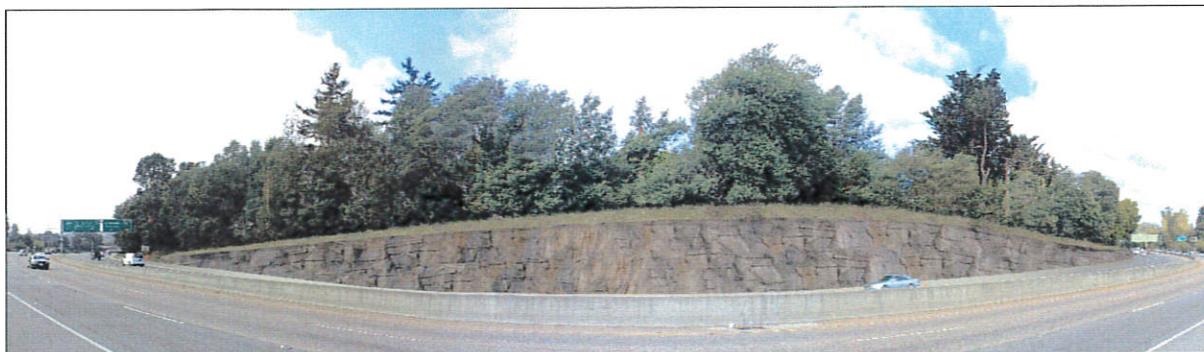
Proposed Condition – Design Option 1 – Soil Nail Wall
